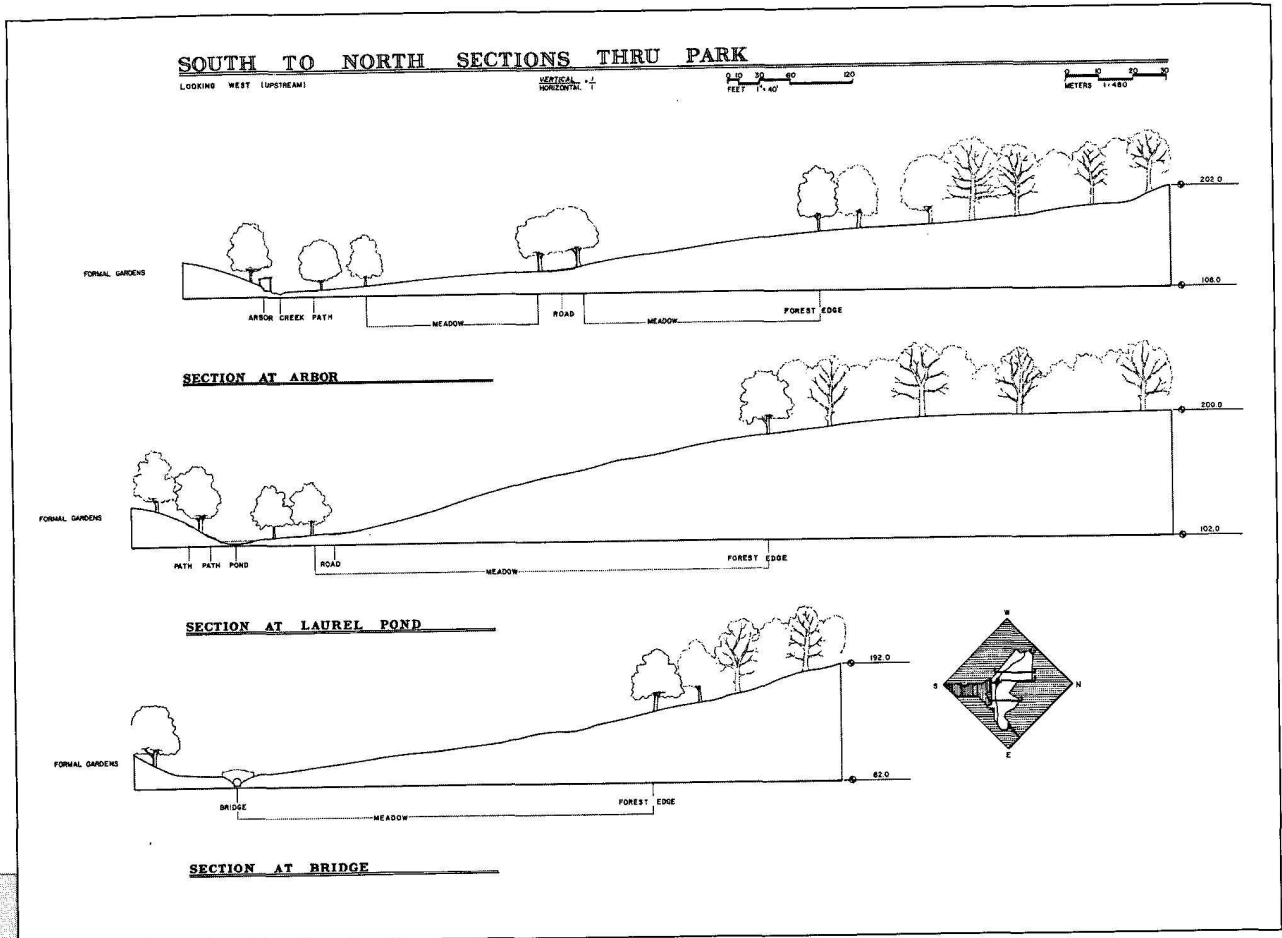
Cross section of stream valley, Summer 1989, *Historic American Building Survey (HABS)*, NCR, *Plans and Drawings Collection*, #863/80015 (Sheet 10 of 28).
